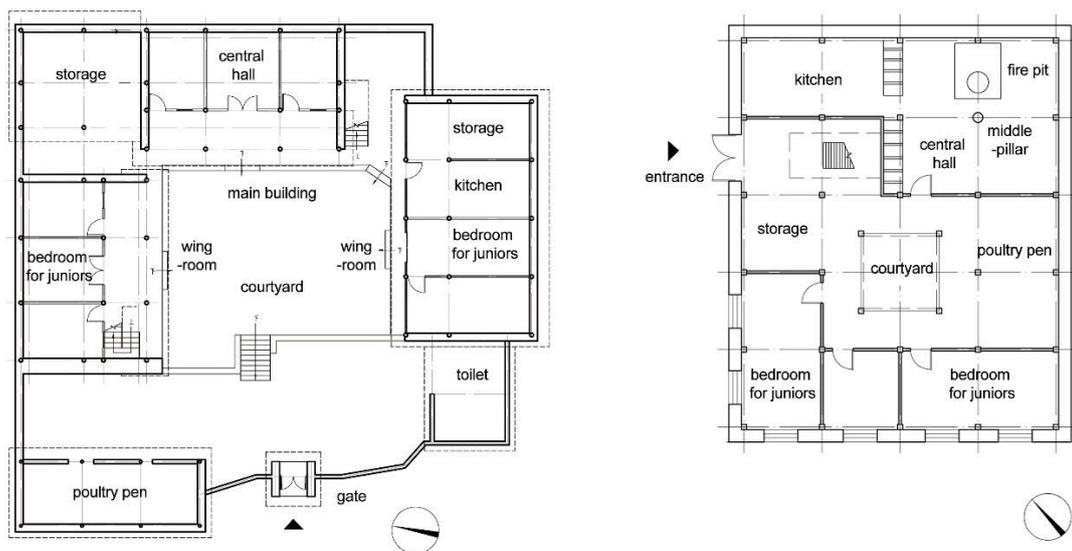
The Plans of Typical Traditional Rural Buildings (Left, a Dwelling of Bai in Yunnan; Right, a Tibetan Dwelling) Drawing by Author
